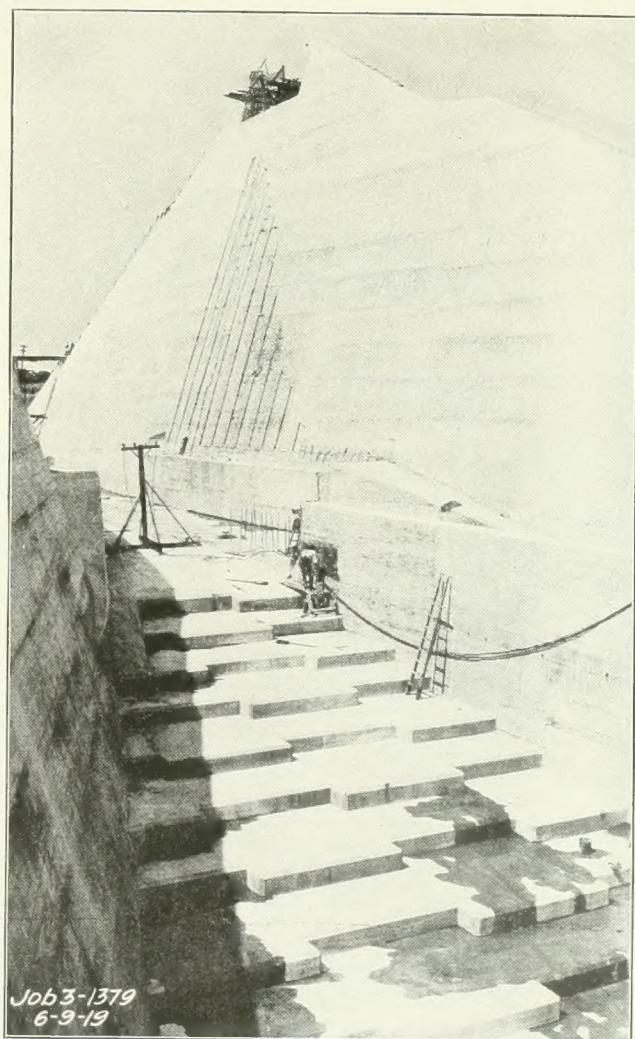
LOCKINGTON OUTLET, LOOKING UP-STREAM
